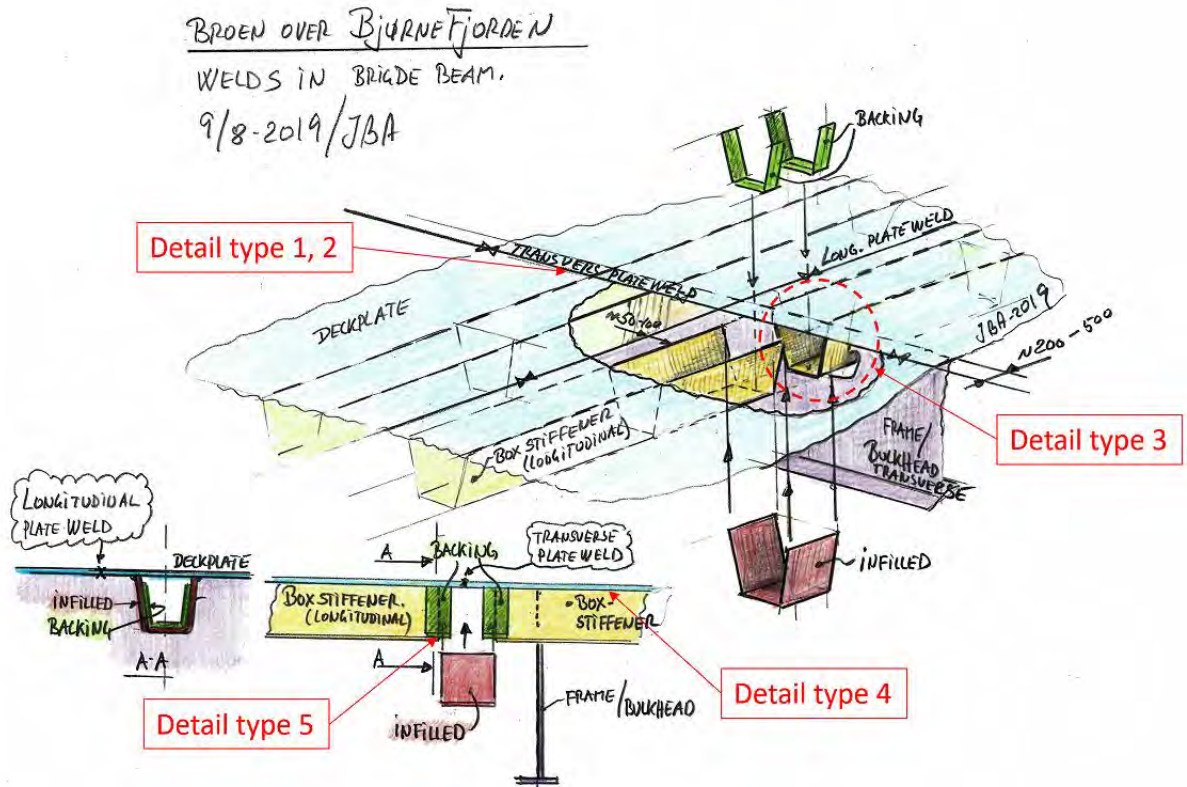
Structural arrangement for bridge girder deck showing typical weld details
